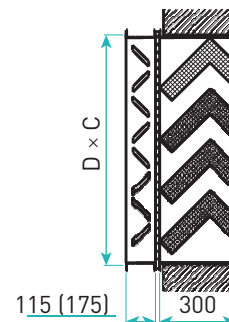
SWG300 damping ventilator with a multileaf damper installed.
